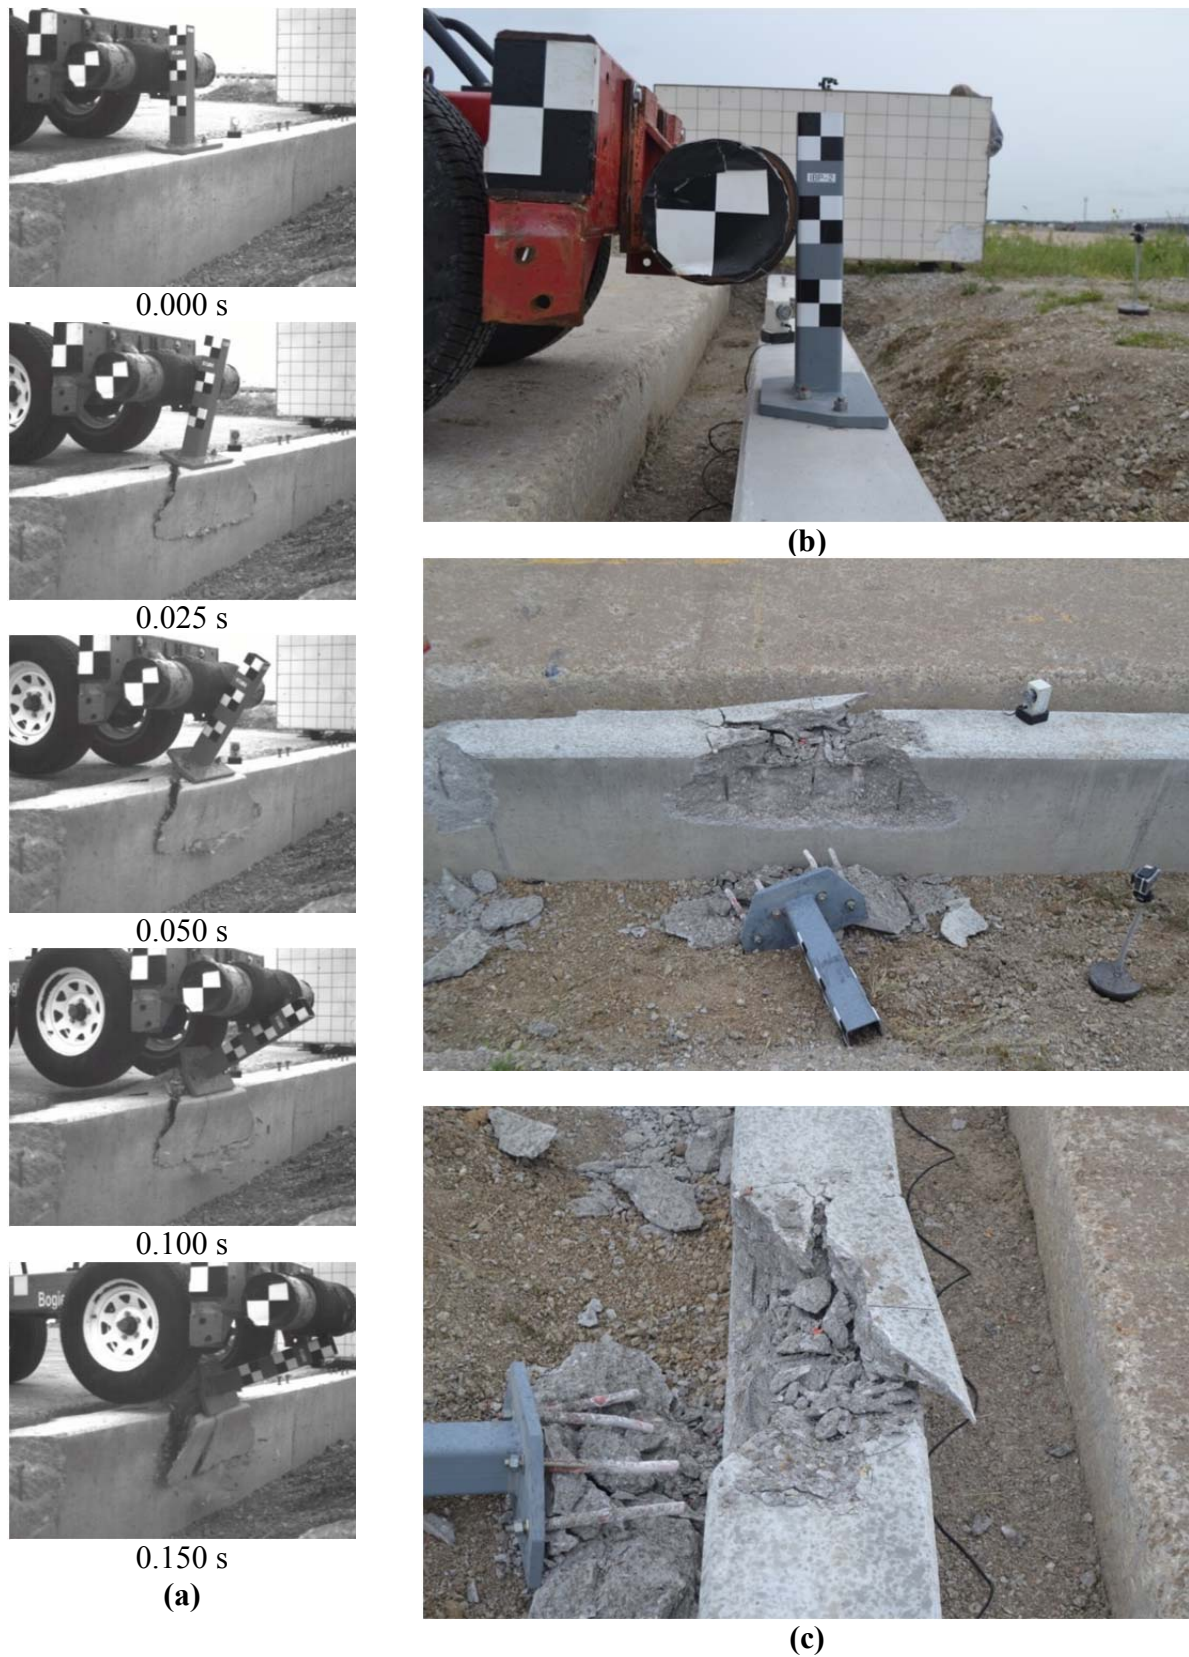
Test No. IBP-2, spread four-anchor concept: (a) sequential events; (b) pre-test; and (c) system damage.
